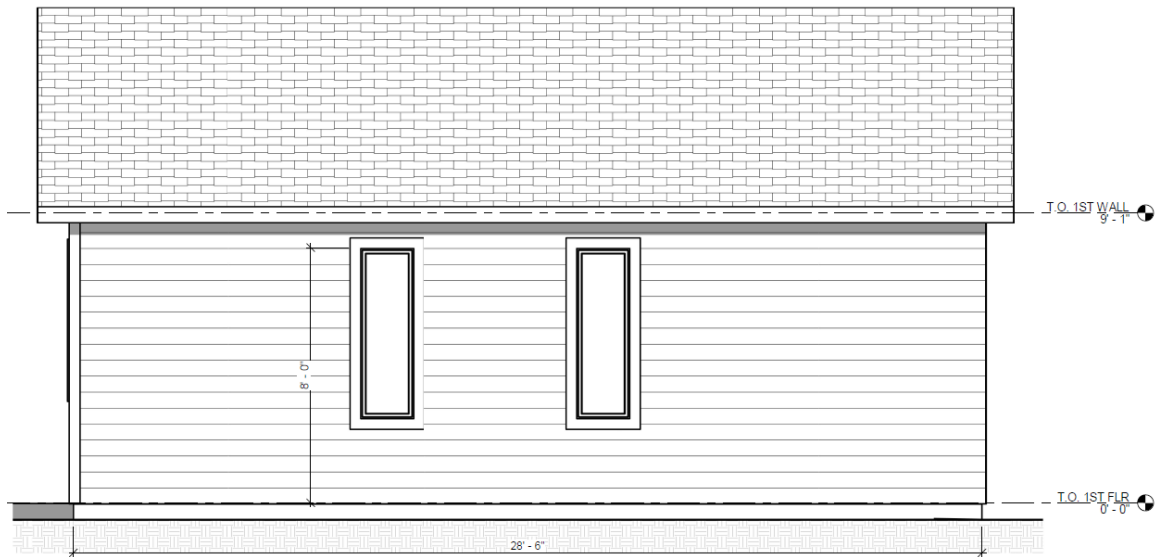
Preliminary Elevation Plan of Detached ARDU – Right, Prepared by Groen Design
